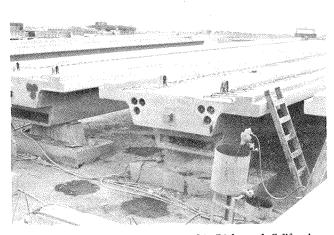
Aerial girder in casting yard in Richmond, California.
